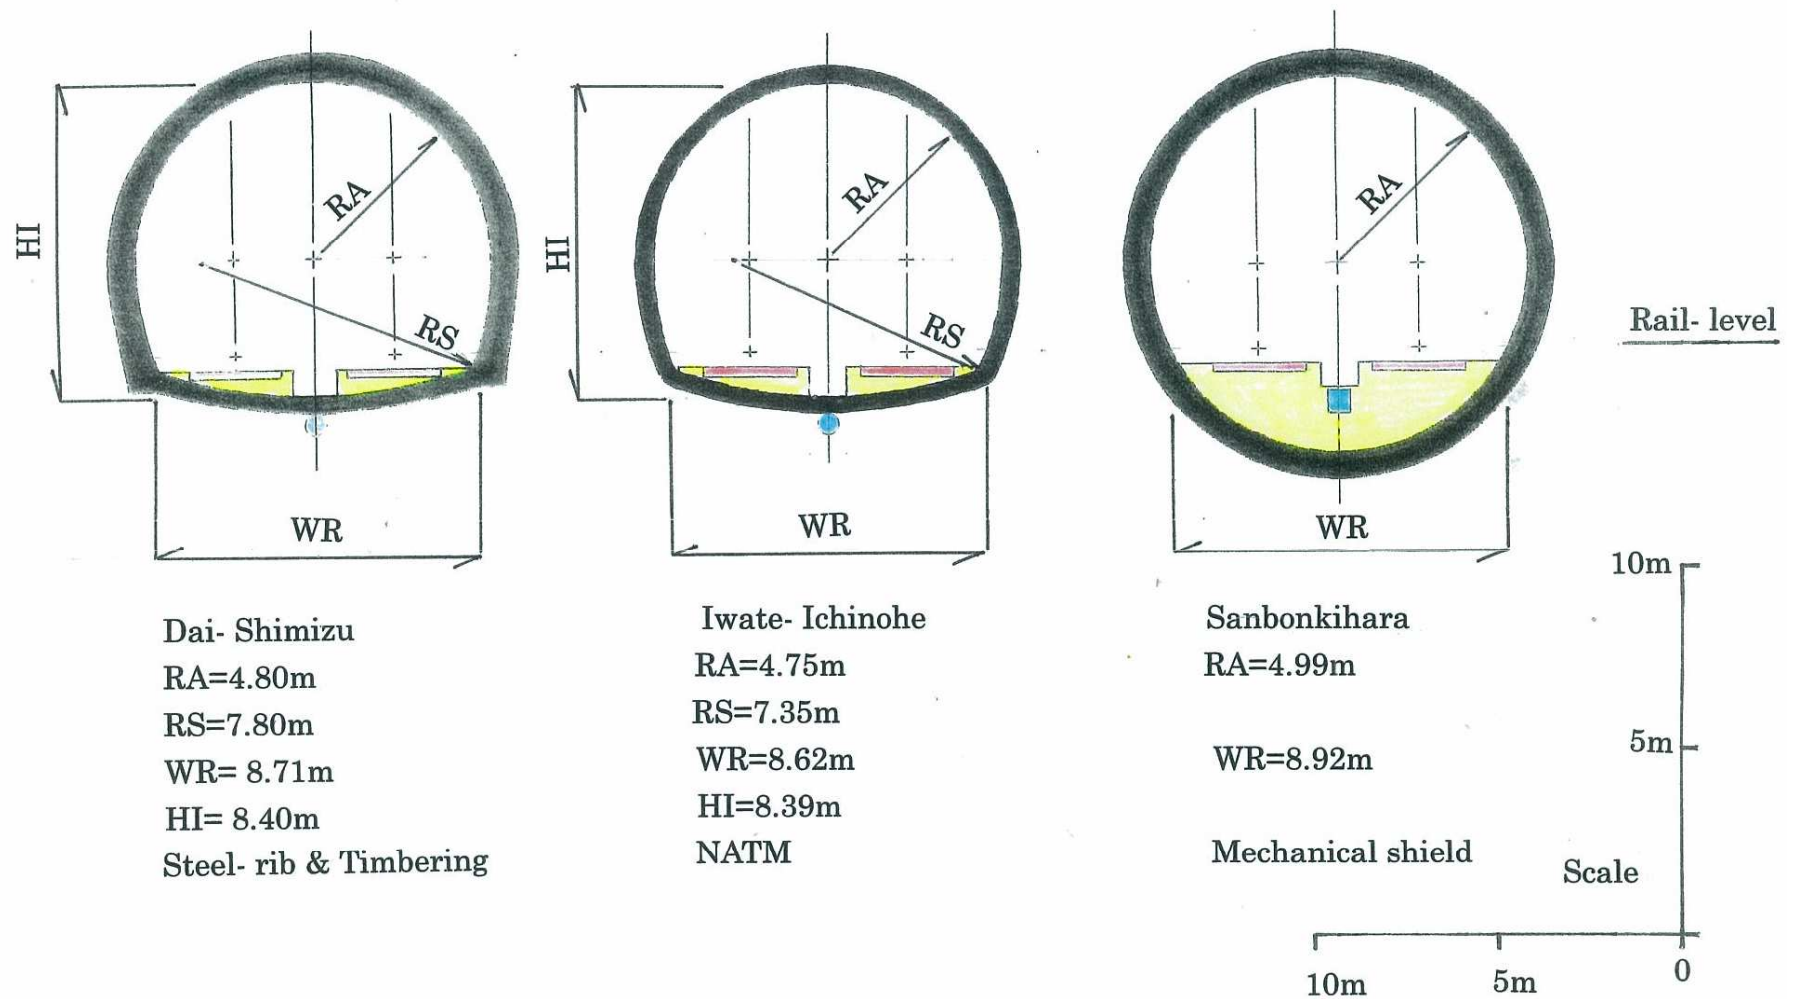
Various Cross-section of tunnels in Shinkansen.
